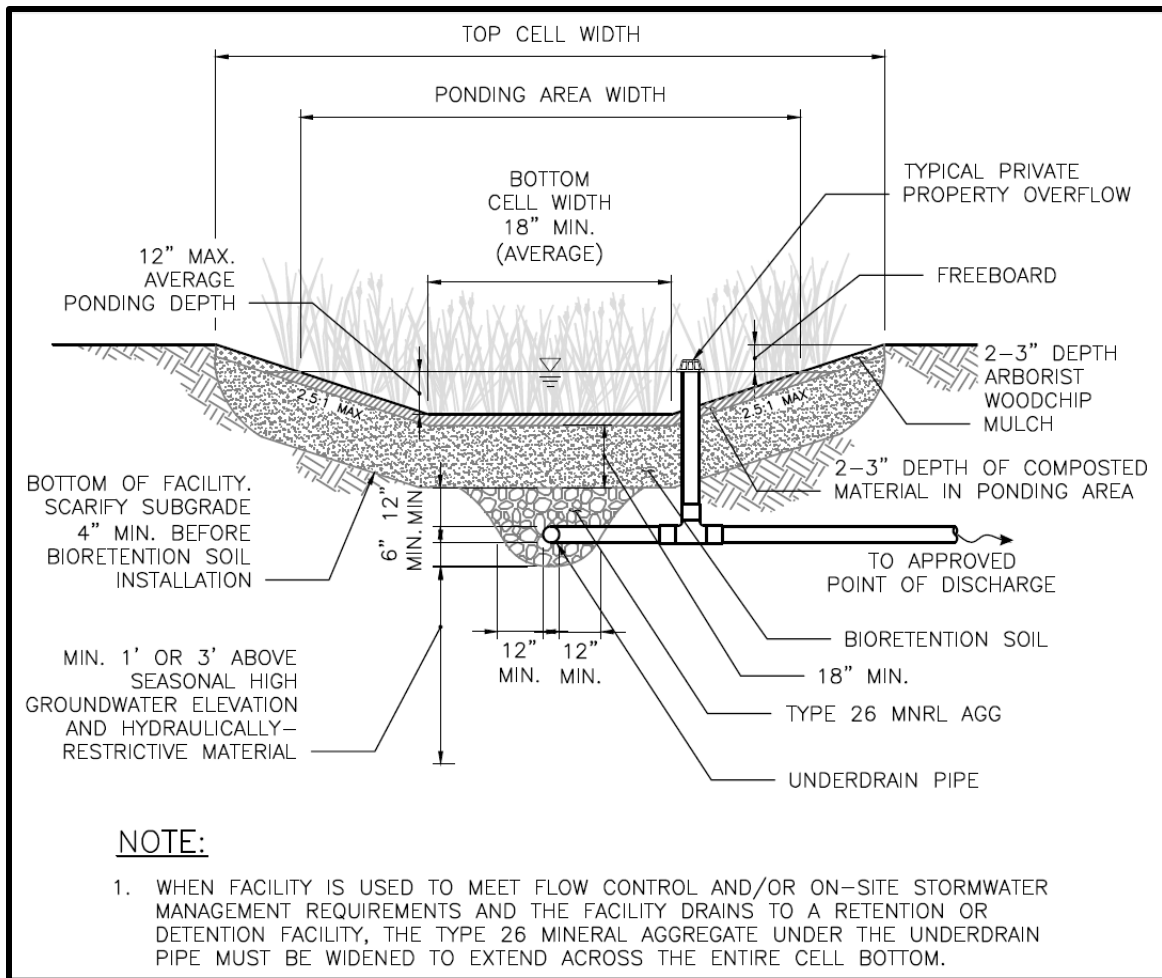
Infiltrating Bioretention Facility with Sloped Sides (with Underdrain).
